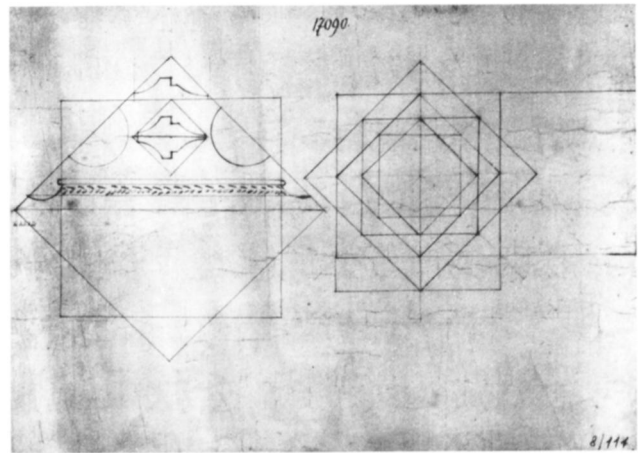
Geometric construction of a base and a mullion (Vienna Akademie).
